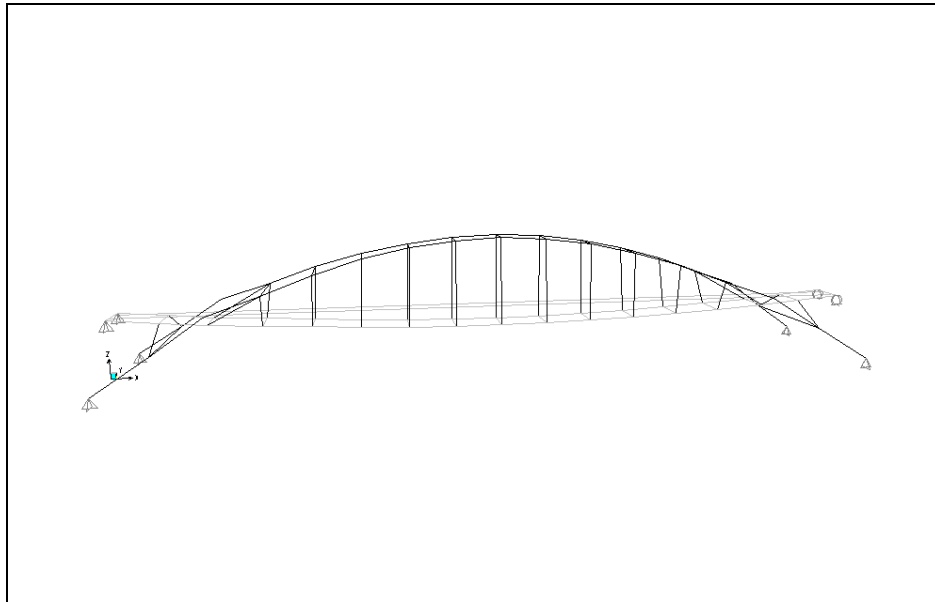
XZ-plane view of deformed shape under dead and live loads.
